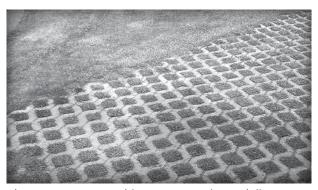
Concrete grid pavement substantially reduces runoff to levels approximating grass cover.
